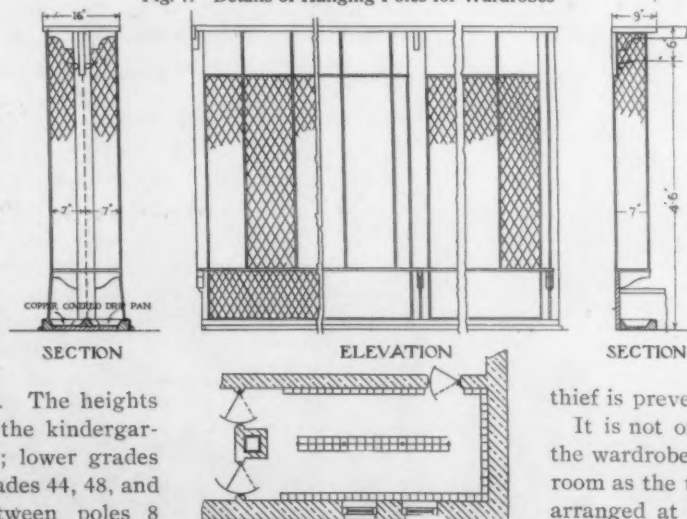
Plan of Wardrobe and Details of Individual Wire Stalls
